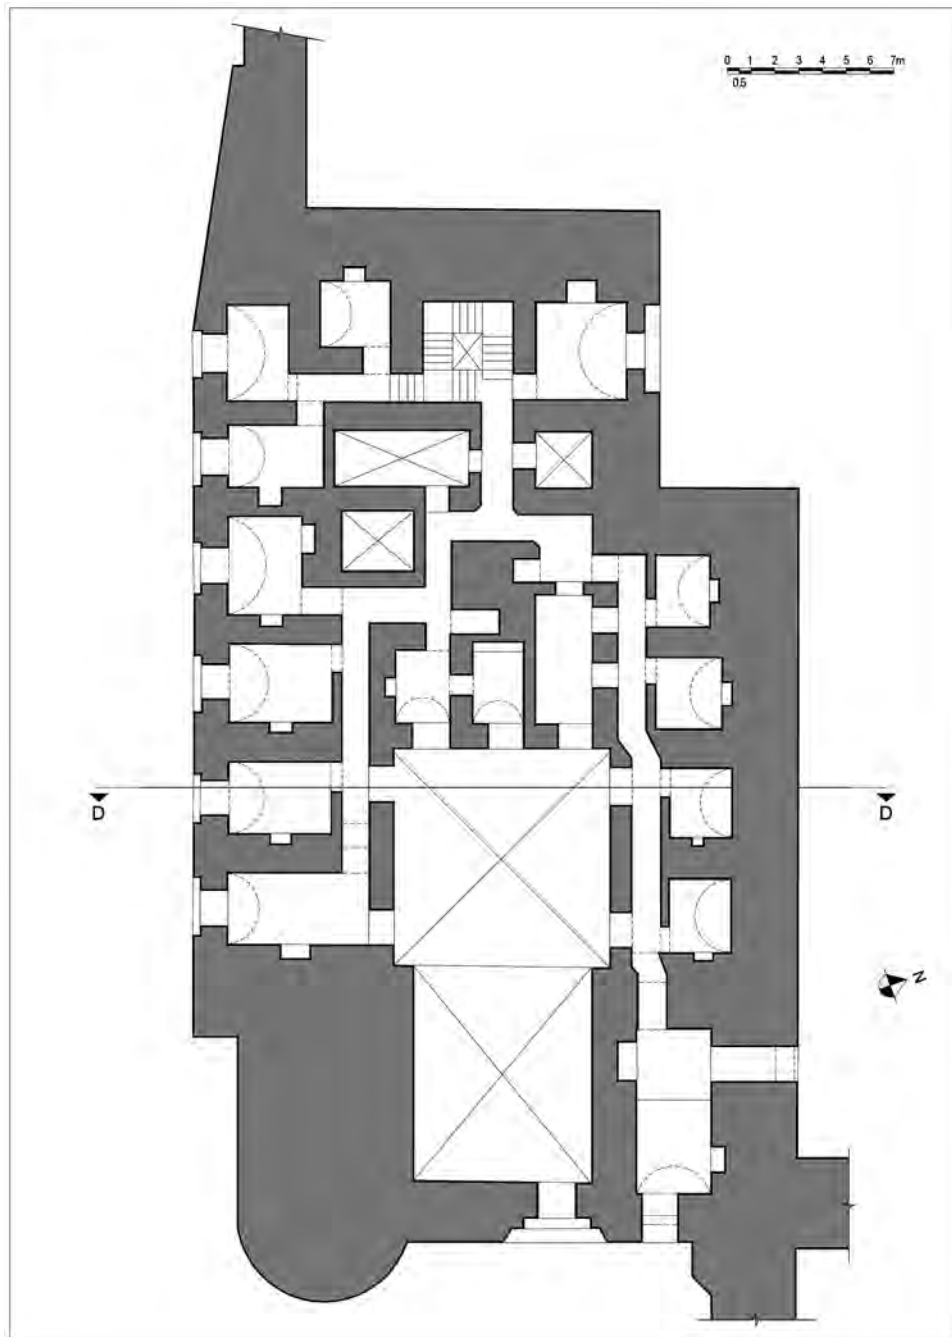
Ḥanafiyah Madrasah, Complex of Sultan Ḥasan, Cairo, second floor plan (H. Al-Harithy)
